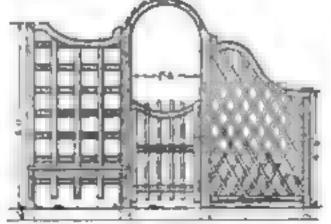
Design for a trellie wreen, detailed in fall on Home Workshop Slurprint No. 34
